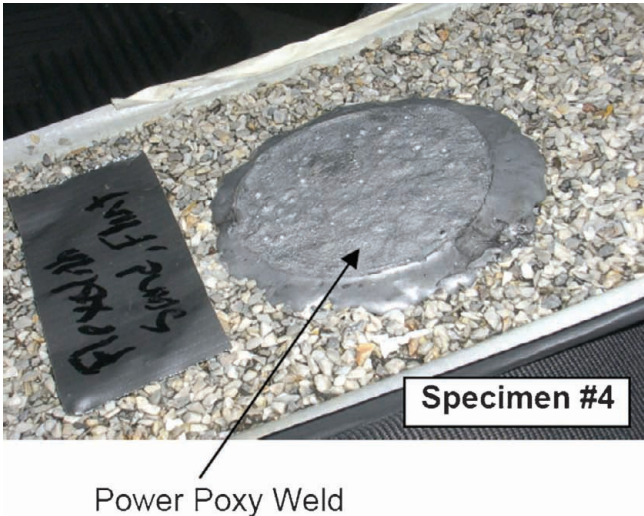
Failure of Steel Disk to Wearing Surface in Test Specimen #4
